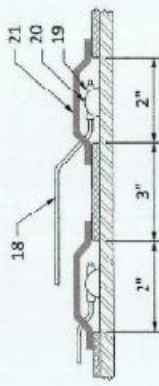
WELD (TD-4150P-20)
